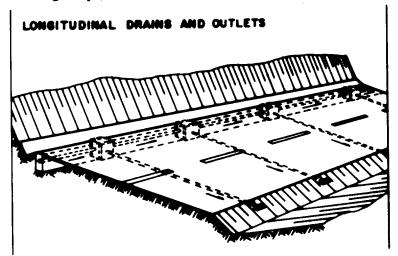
Perspective view of test sections, collector boxes and drain outlets.
